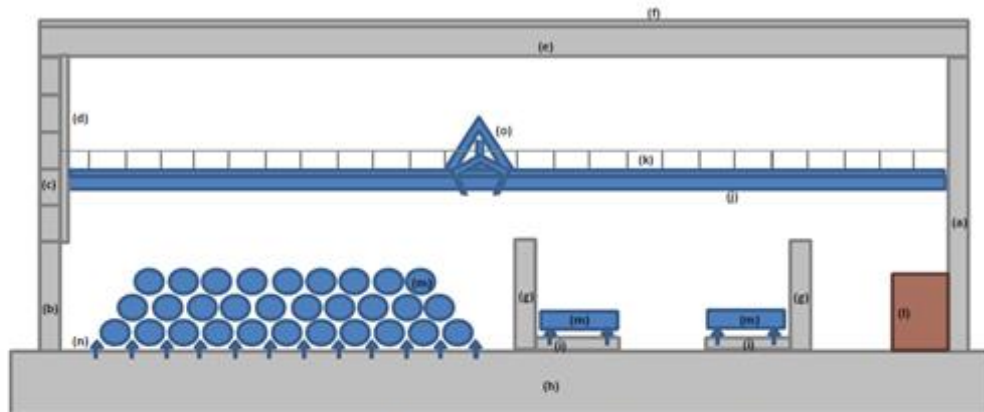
CHF cross section (looking North, with South Shield wall removed)
